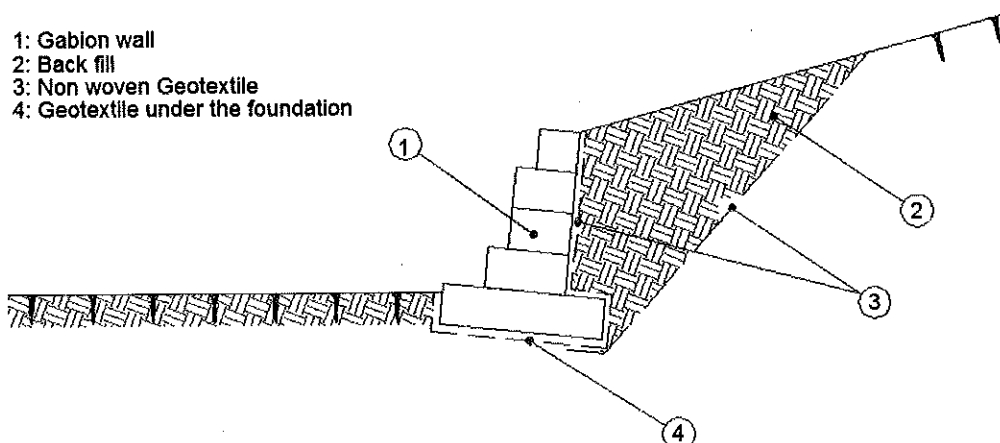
Use of Non-woven Geotextile in Gabion Retaining Wall
